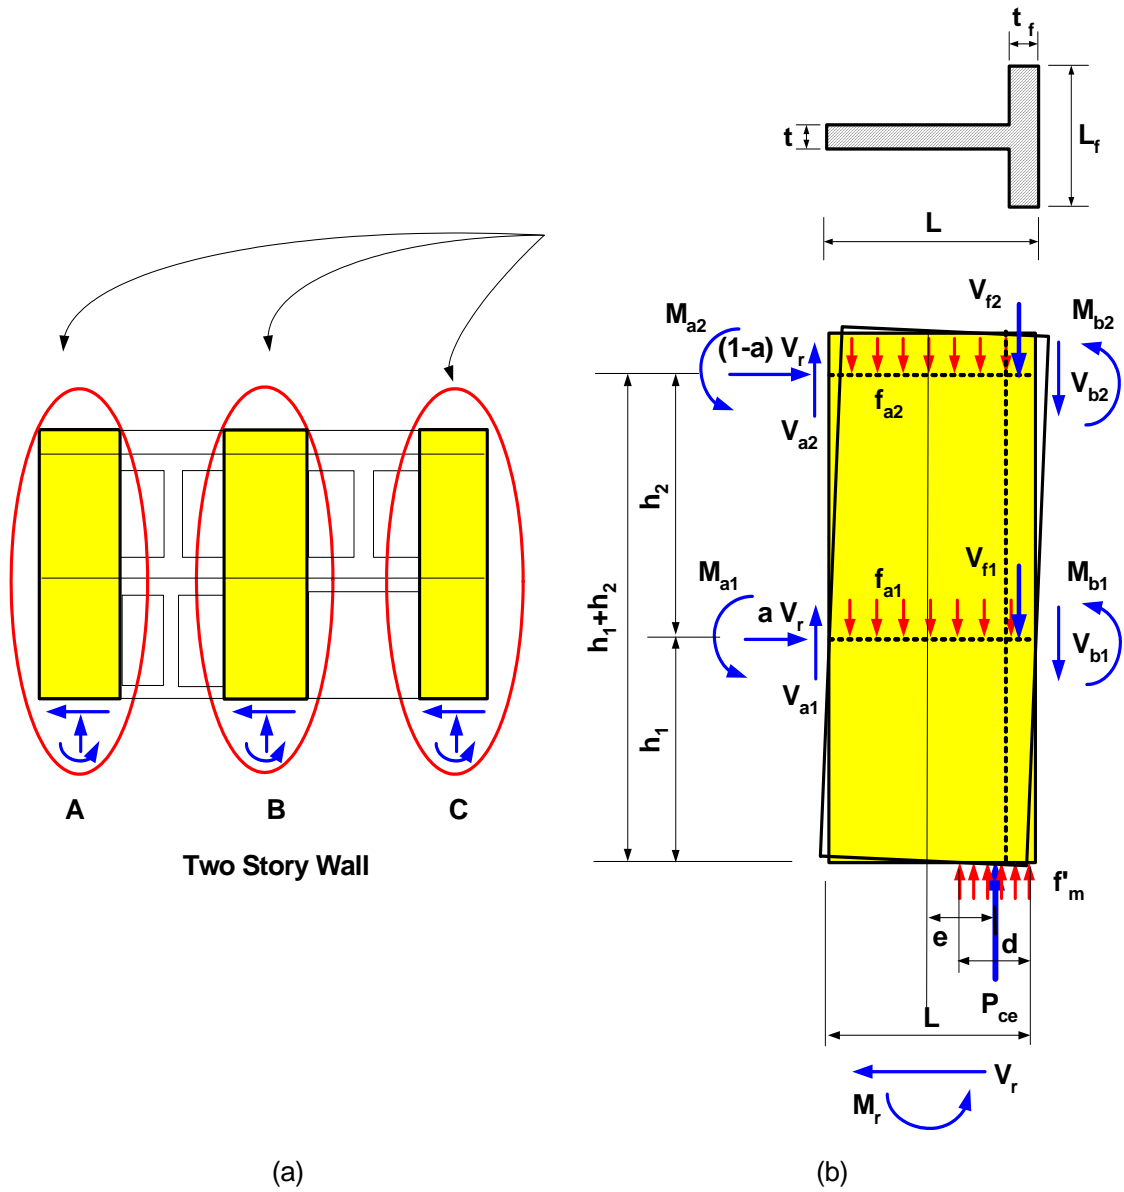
Assumed free body diagram of a two-story pier associated with a multiple-story rocking failure.
